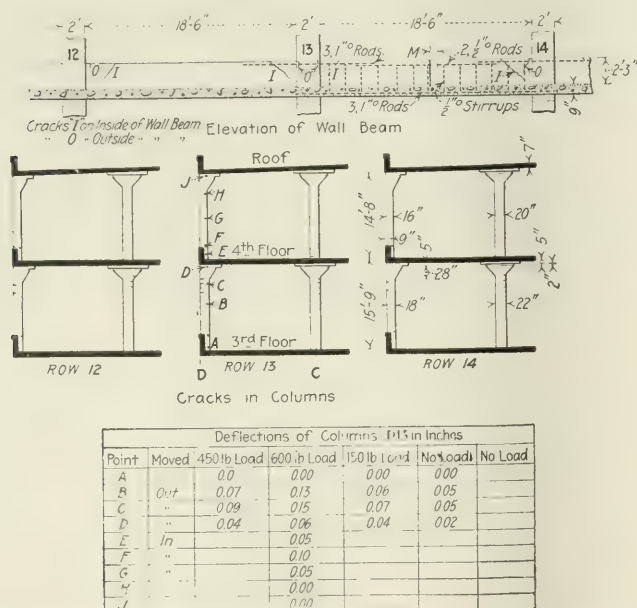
ELEVATION OF WALL BEAM AND OF COLUMNS UNDER LOADED SECTION
